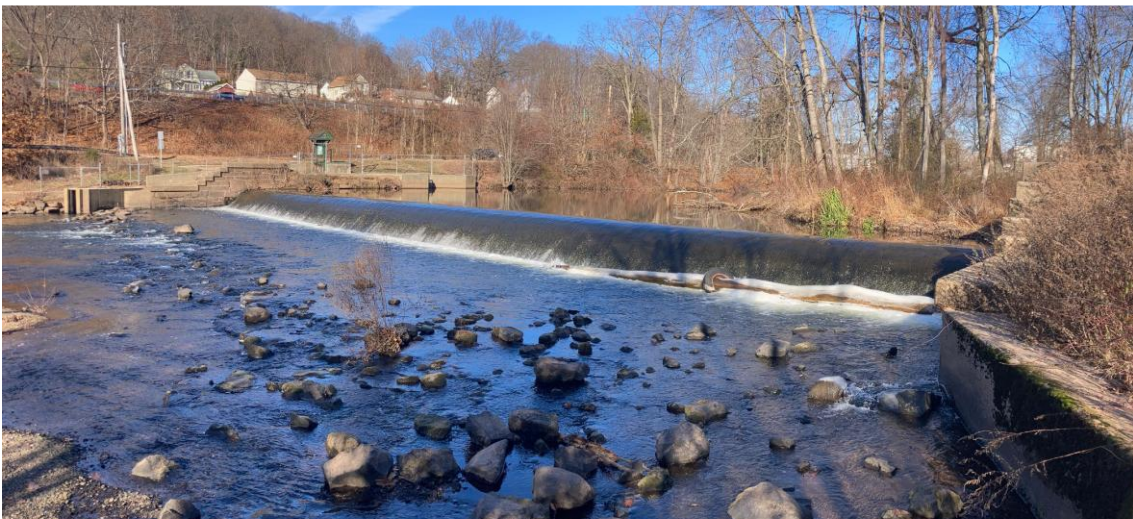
Wallace Dam on the Quinnipiac River, Wallingford, CT
